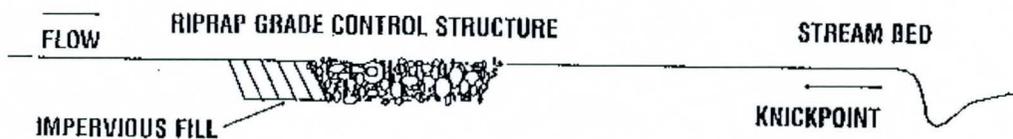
As-built riprap grade control structure with impervious fill cutoff wall.
